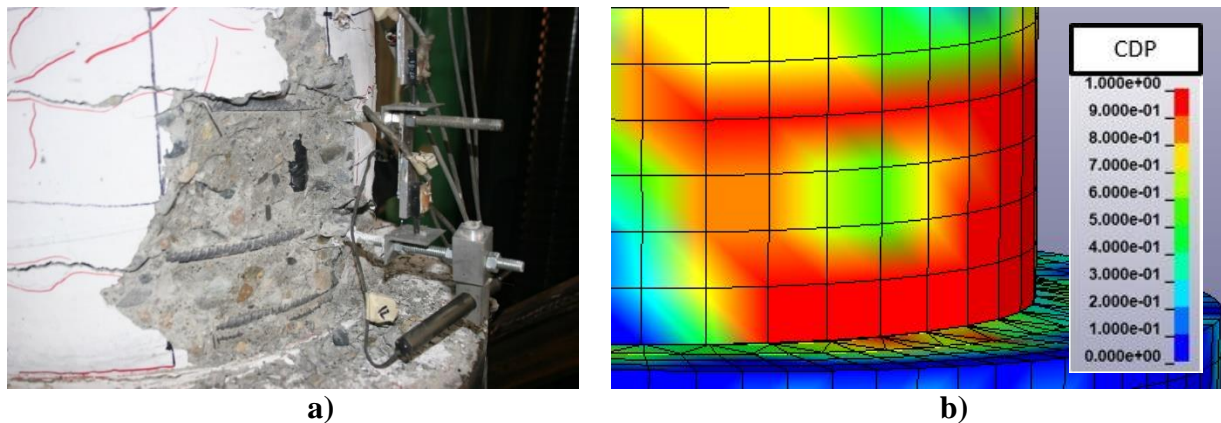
Specimen 30-21-LD Exposed Longitudinal Reinforcement and Compressive Damage at 5.5% Drift: a) Observed and b) Simulated
